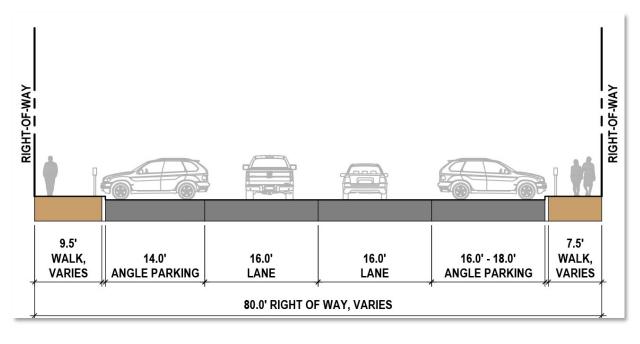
5th St - Existing Cross-Sections Between Rood Ave & Grand Ave
